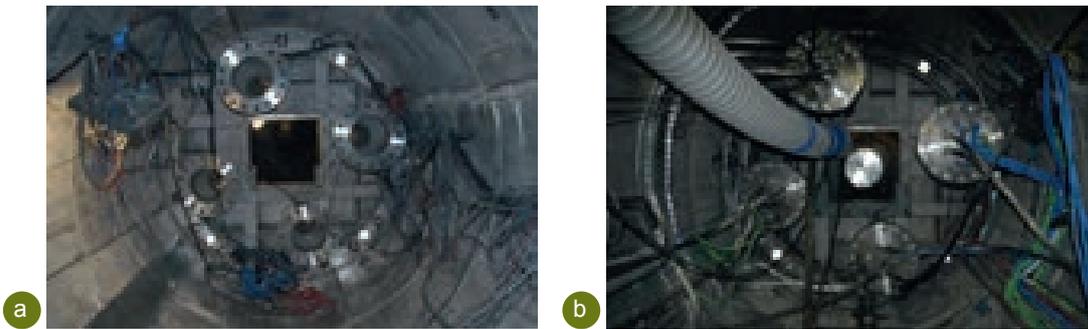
The instrumentation feed-throughs are embedded in 4 flanges bolted onto the hydraulic seal: (a) hydraulic seal after its installation; (b) hydraulic seal near the end of the backfill installation.
